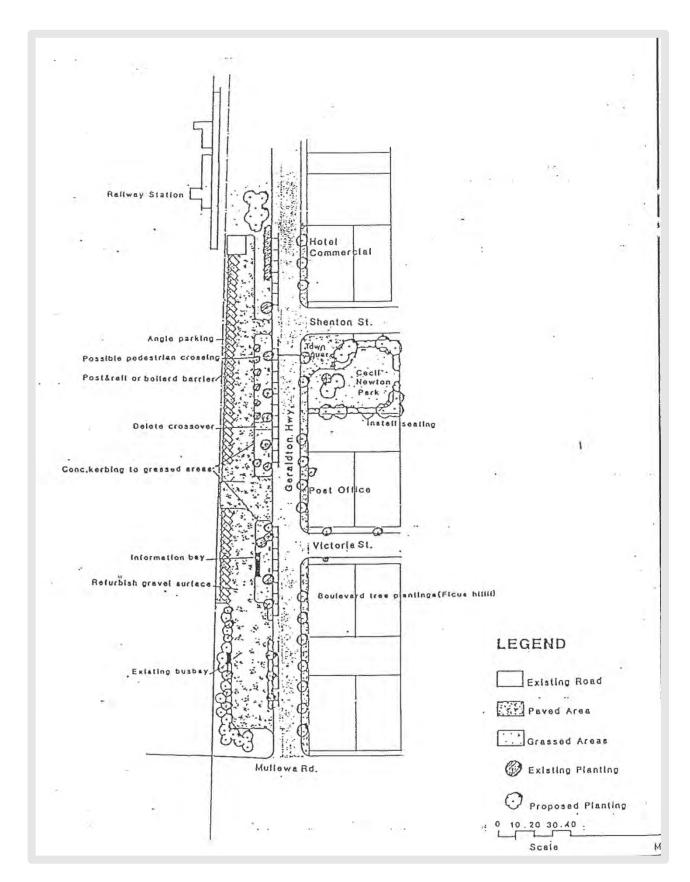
MINGENEW TOWNSCAPE PLAN
